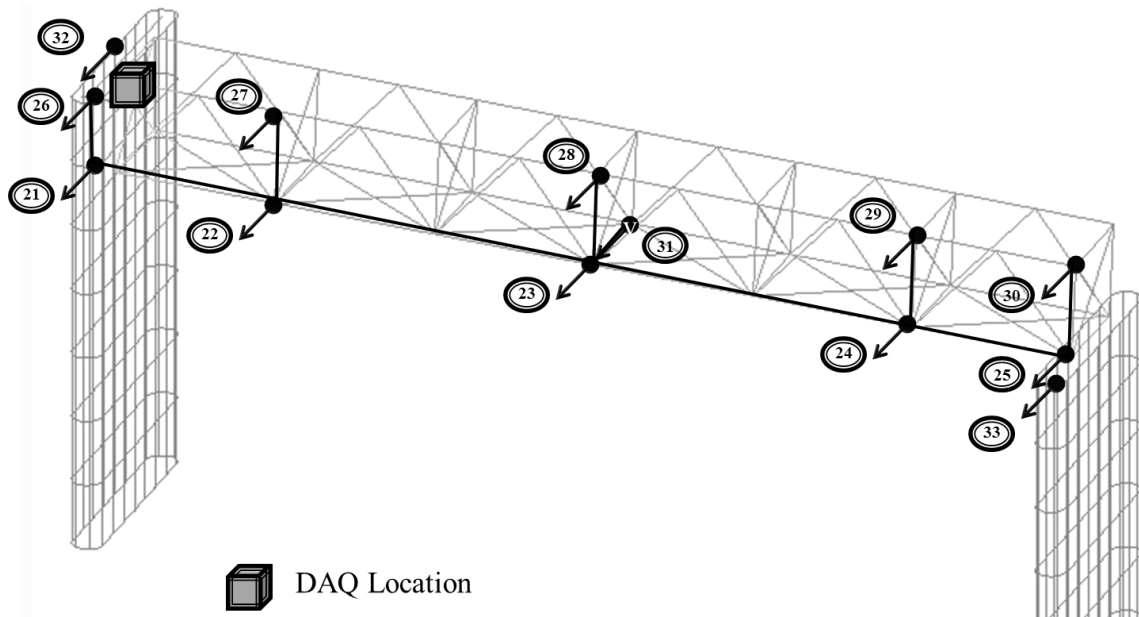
NJ Truss Span Lateral Instrumentation Plan
